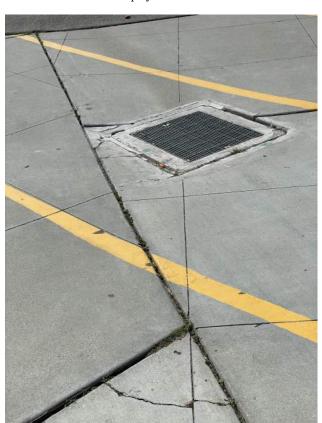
Cracks in concrete walkways. Taken on 04/26/2022 by Belli Architectural Group.
